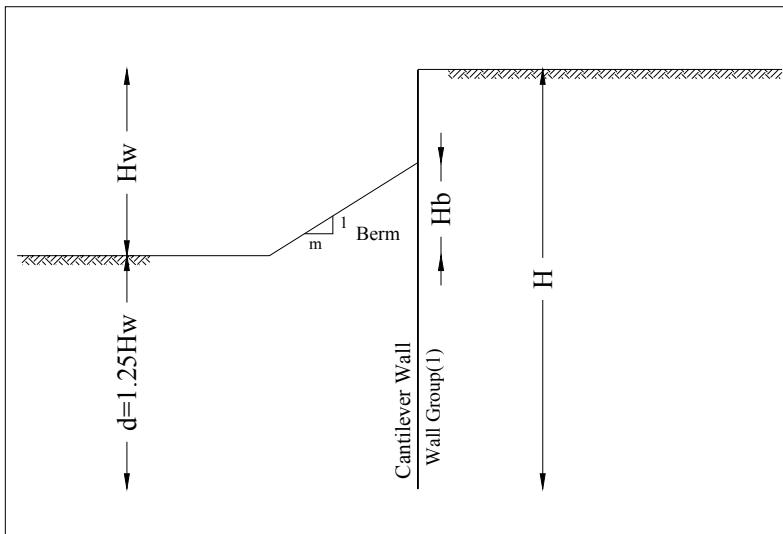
Geometry of the Bermed Wall with Zero Top Width
